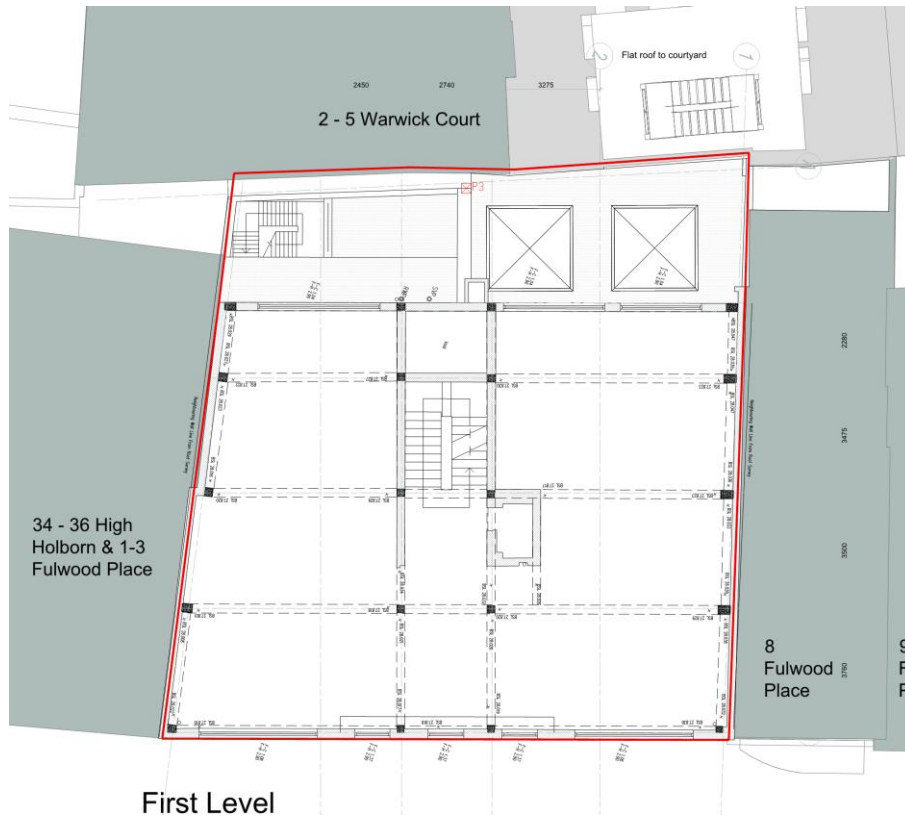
Existing first floor plan of Elizabeth House identifying floor area of 8 Fulwood Place
